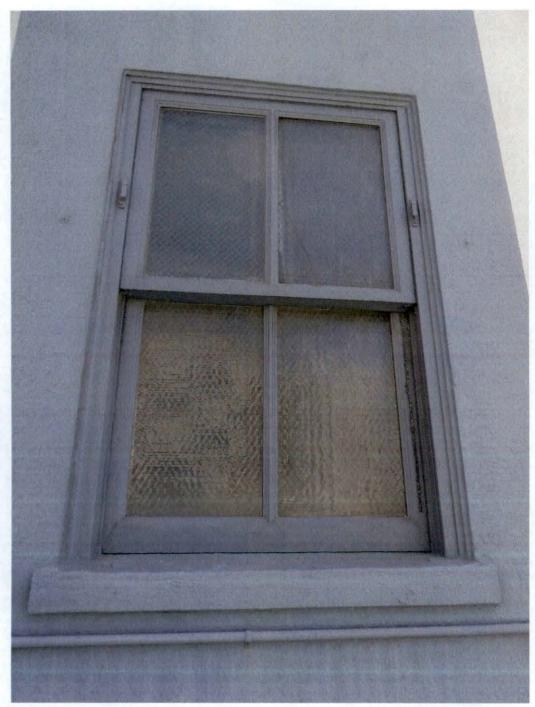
Photo J: View of sheet metal and wood window at north elevation looking south at 7th level exterior.
